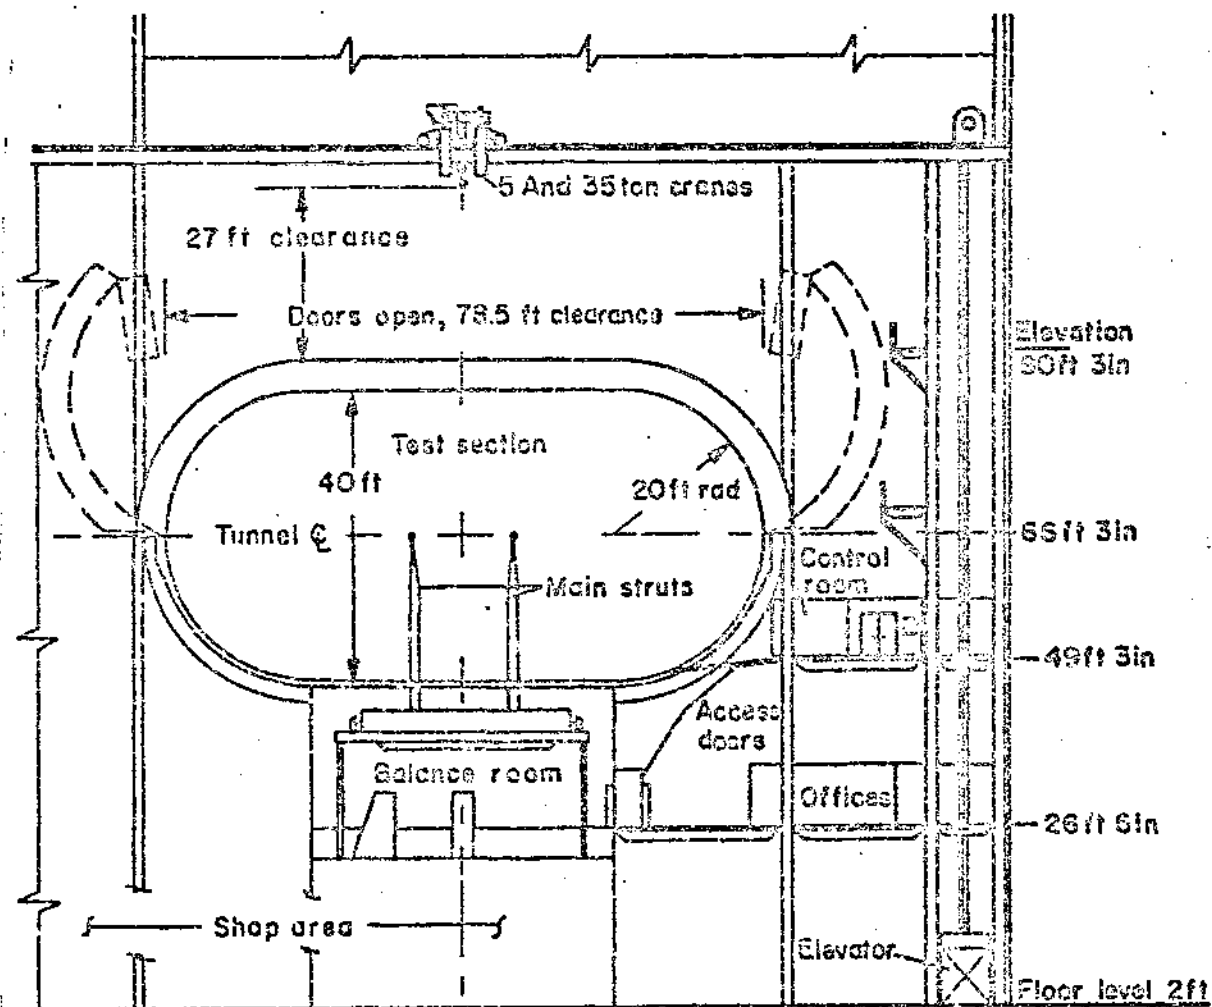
CROSS-SECTION OF NASA-AMES 40-BY-80 FOOT WIND TUNNEL
